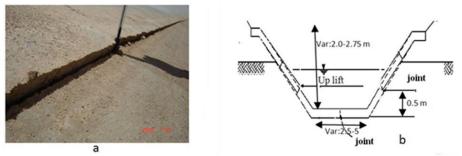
a. Locations of damage to the concrete lining of canals and b. Schematic section view of concrete lining uplift in Tabriz Plain project
